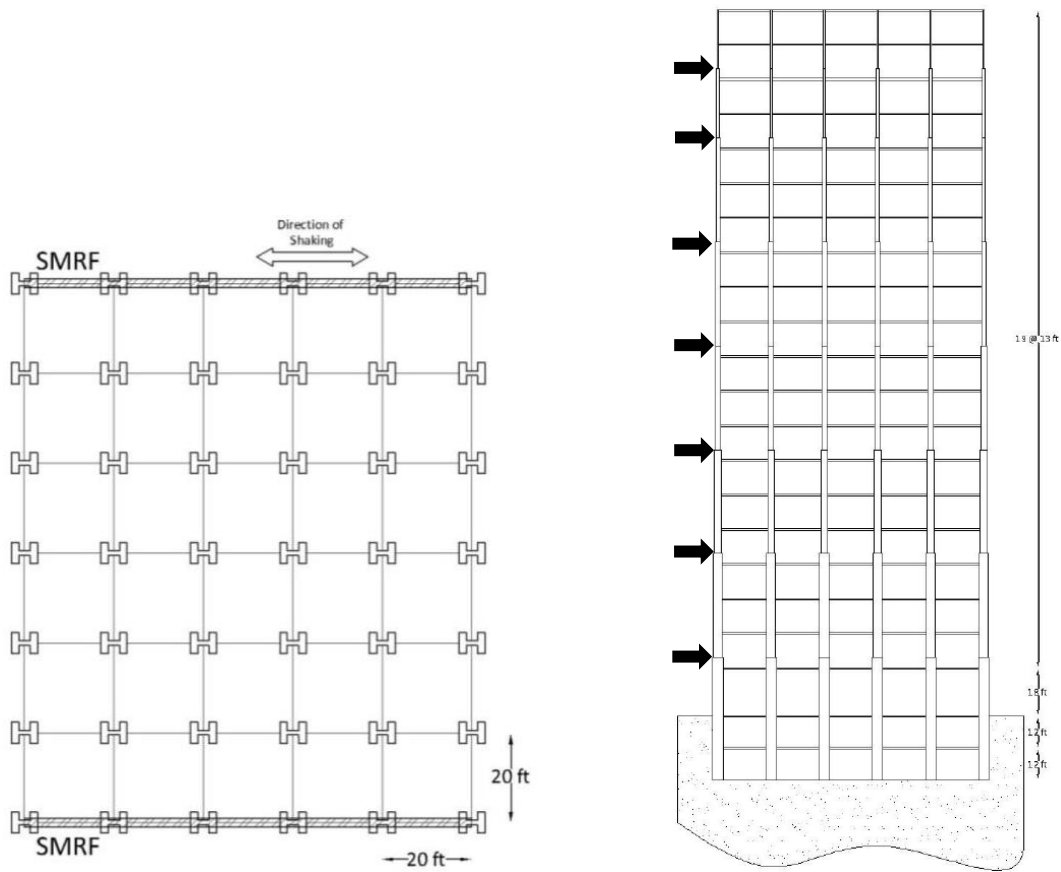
Plan and Elevation View of the 20-Story SMRF (Shaw, 2013)
